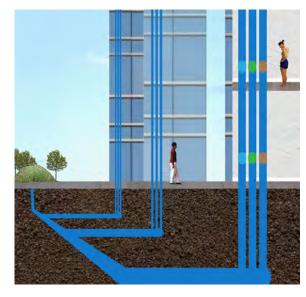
Vacuum Waste Collection Diagram: Chutes in Buildings Transport Waste to Central Collection Facility
